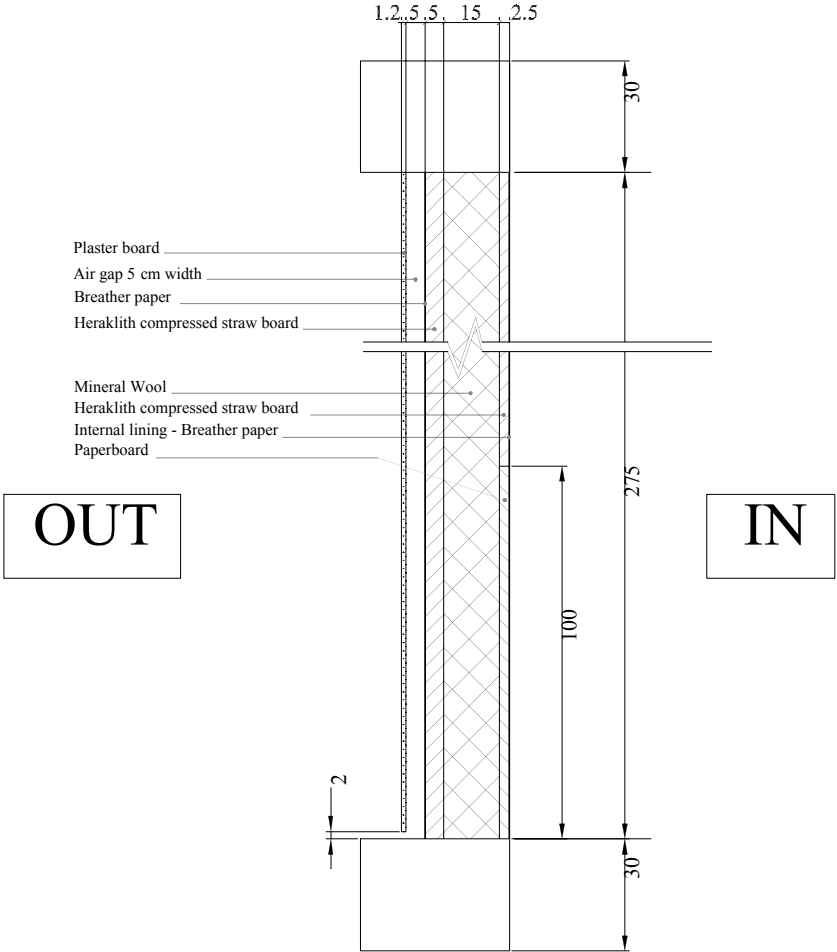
Cross-section of the linked wall component (dimensions in cm).
